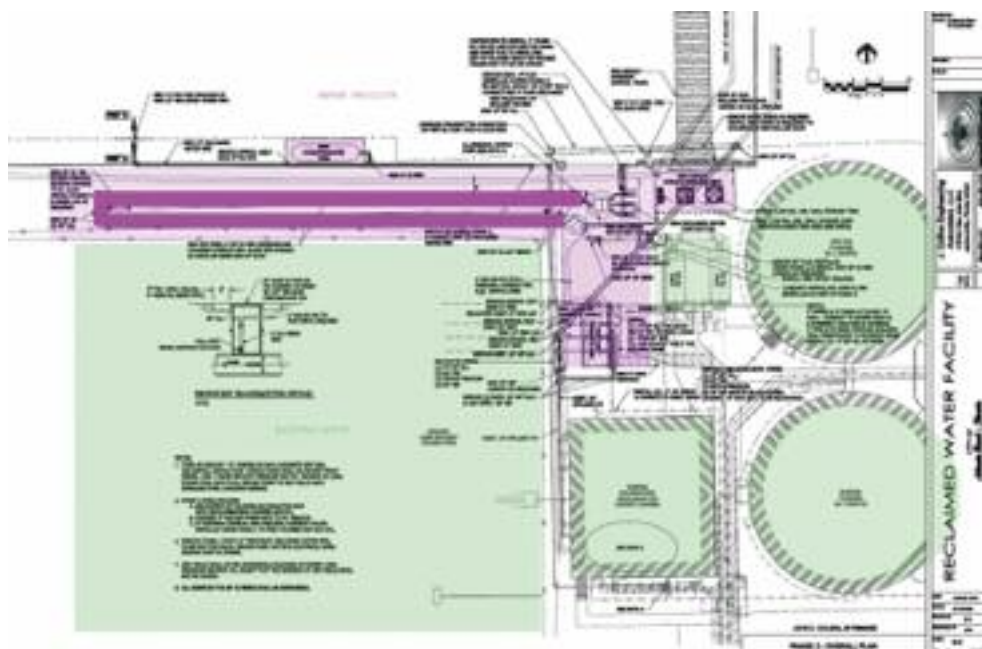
Final Siting for Reclaimed Water Facility/Chlorine Contact Pipe
